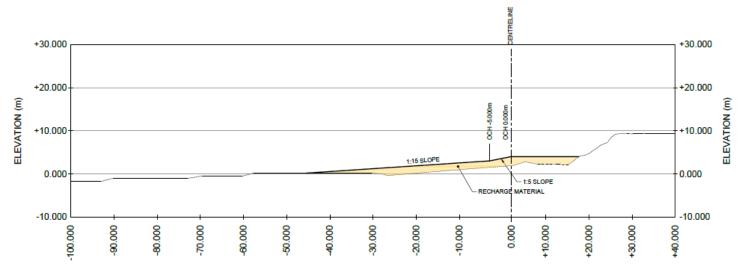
Typical cross section at Ostend - Element 2 Villages
